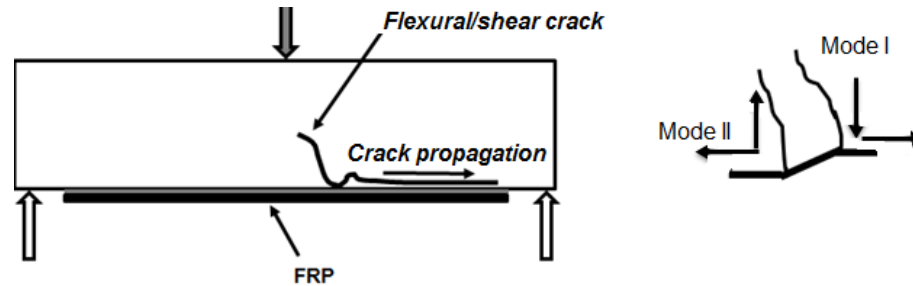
Typical Mixed-mode intermediate crack (IC) debonding failure
